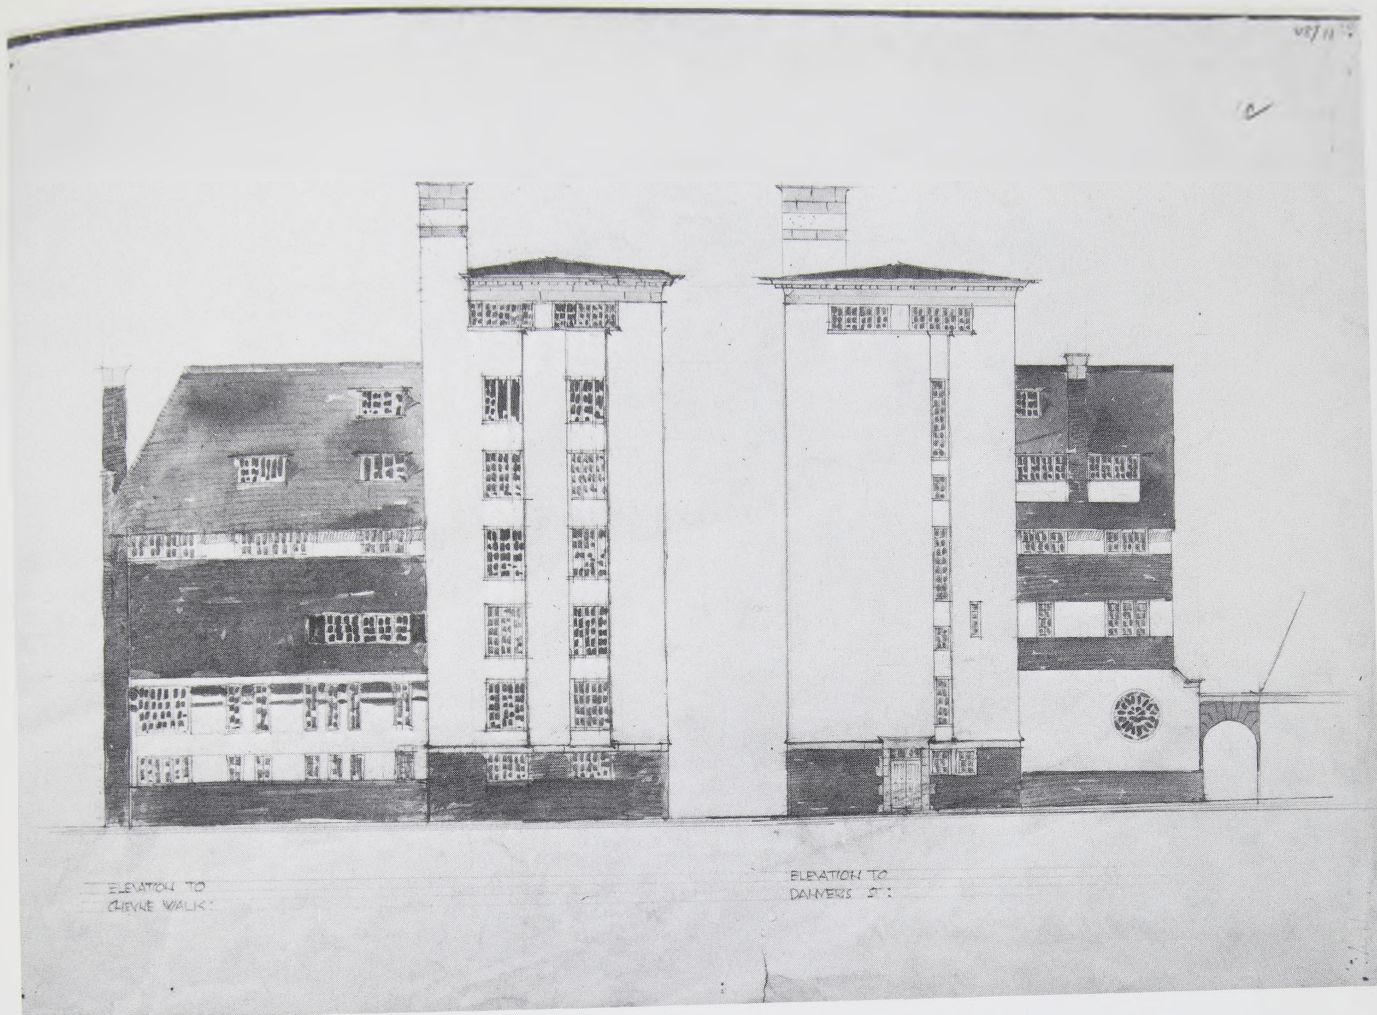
Charles Robert Ashbee. London, 'Danvers Tower', corner of Cheyne Walk and Danvers Street:
